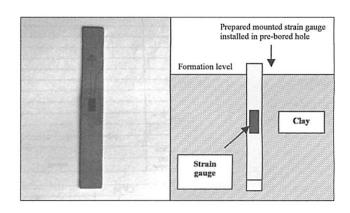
Strain gauged insert for instrumented heave reducing piles
